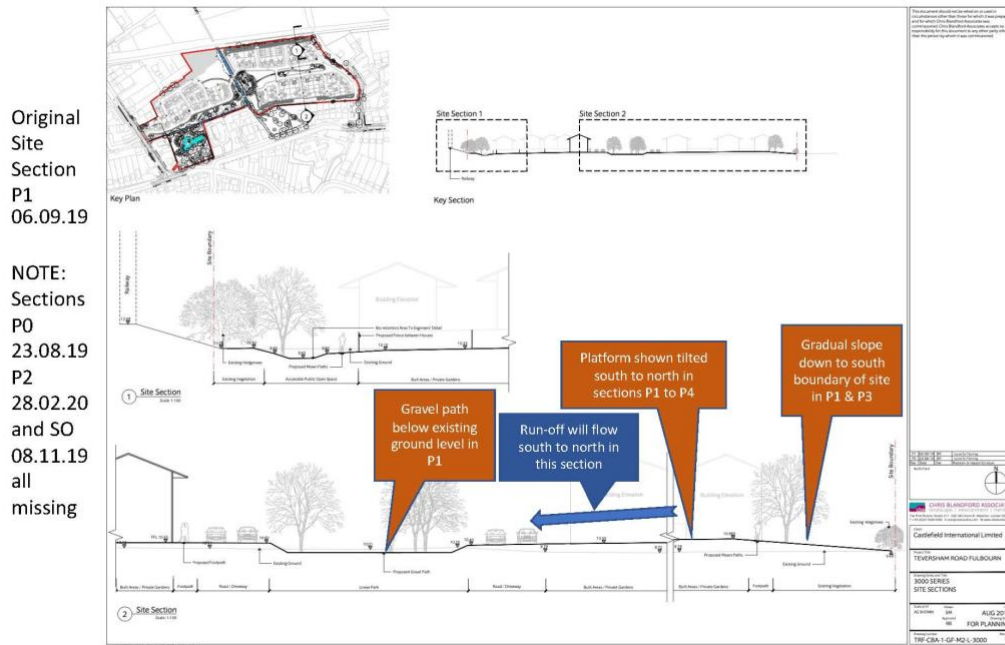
Original site section P1 12.11.20 shows development platform sloping south to north.
